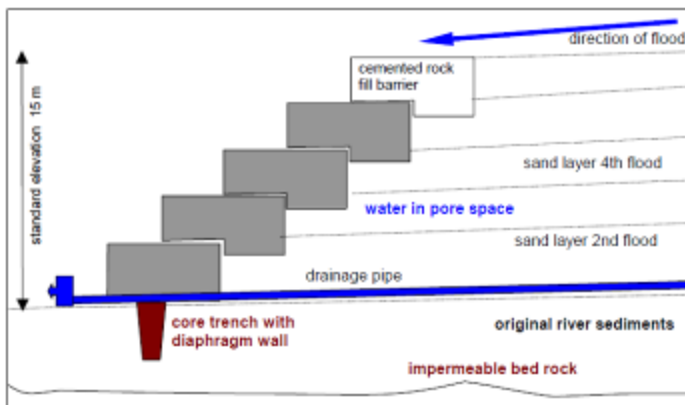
Stepped spillway: alternative method for progressive extension of central dam spillway
